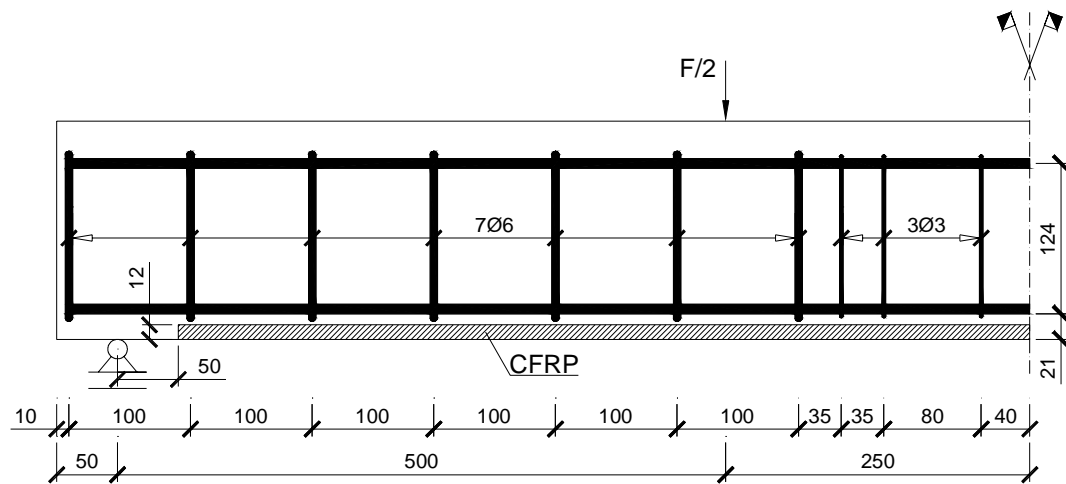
NSM technique applied to reinforced concrete beams (Barros and Fortes 2002): specimen geometry, reinforcement arrangement, supports and loading. Note: all dimensions are in millimeters.
